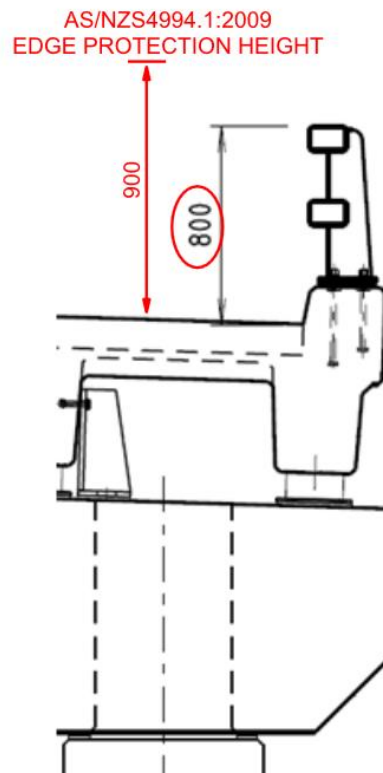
Traffic barrier layout (RMS [annotated], 2016)
